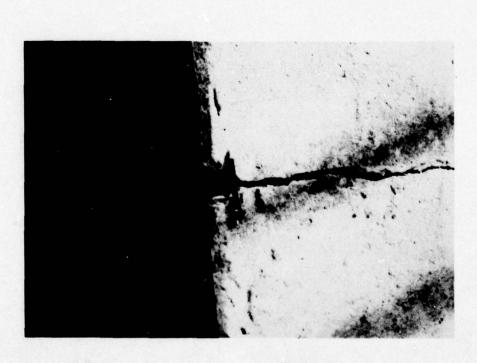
Vertical view of crack at center of left (south) wing wall
